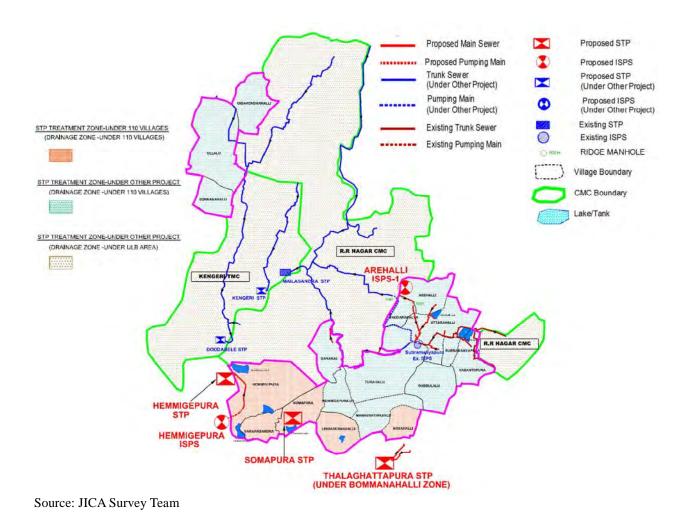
Layout Plan of Main Sewer Lines in R.R. Nagar Zone
